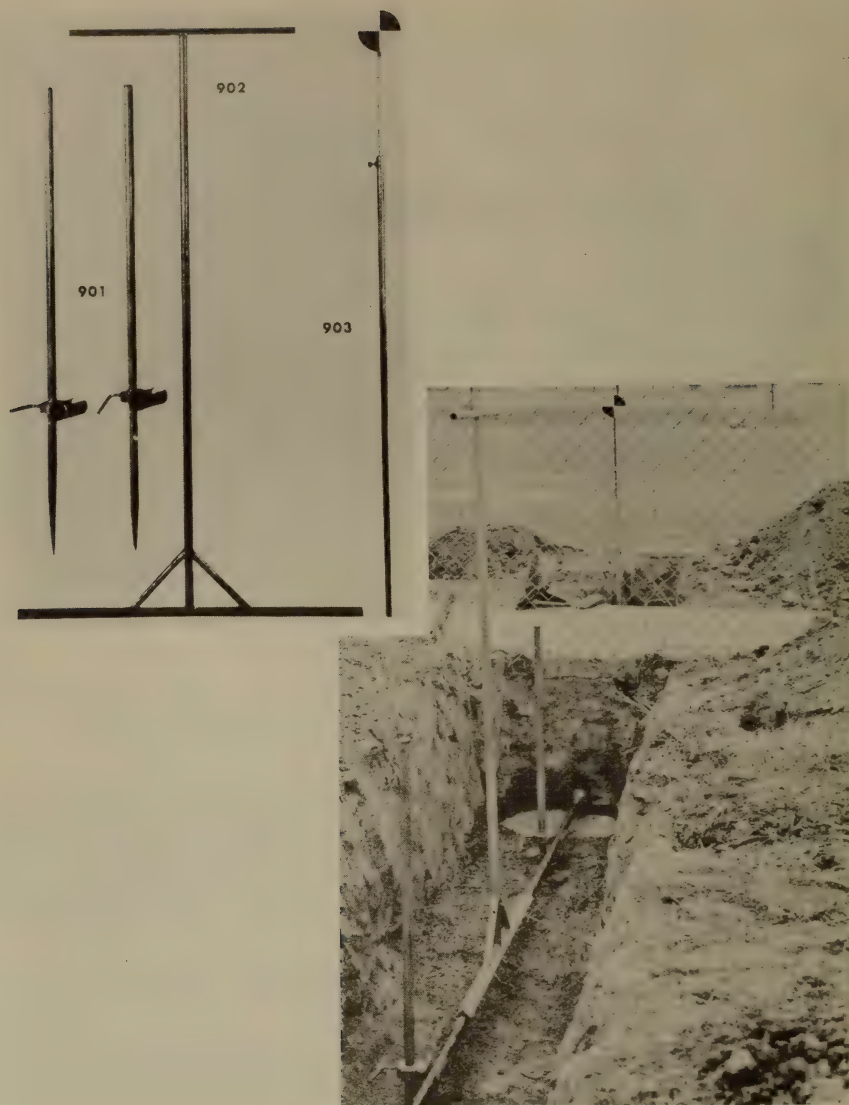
Sighting Equipment for Alinement of Drill Rod and Bit.
